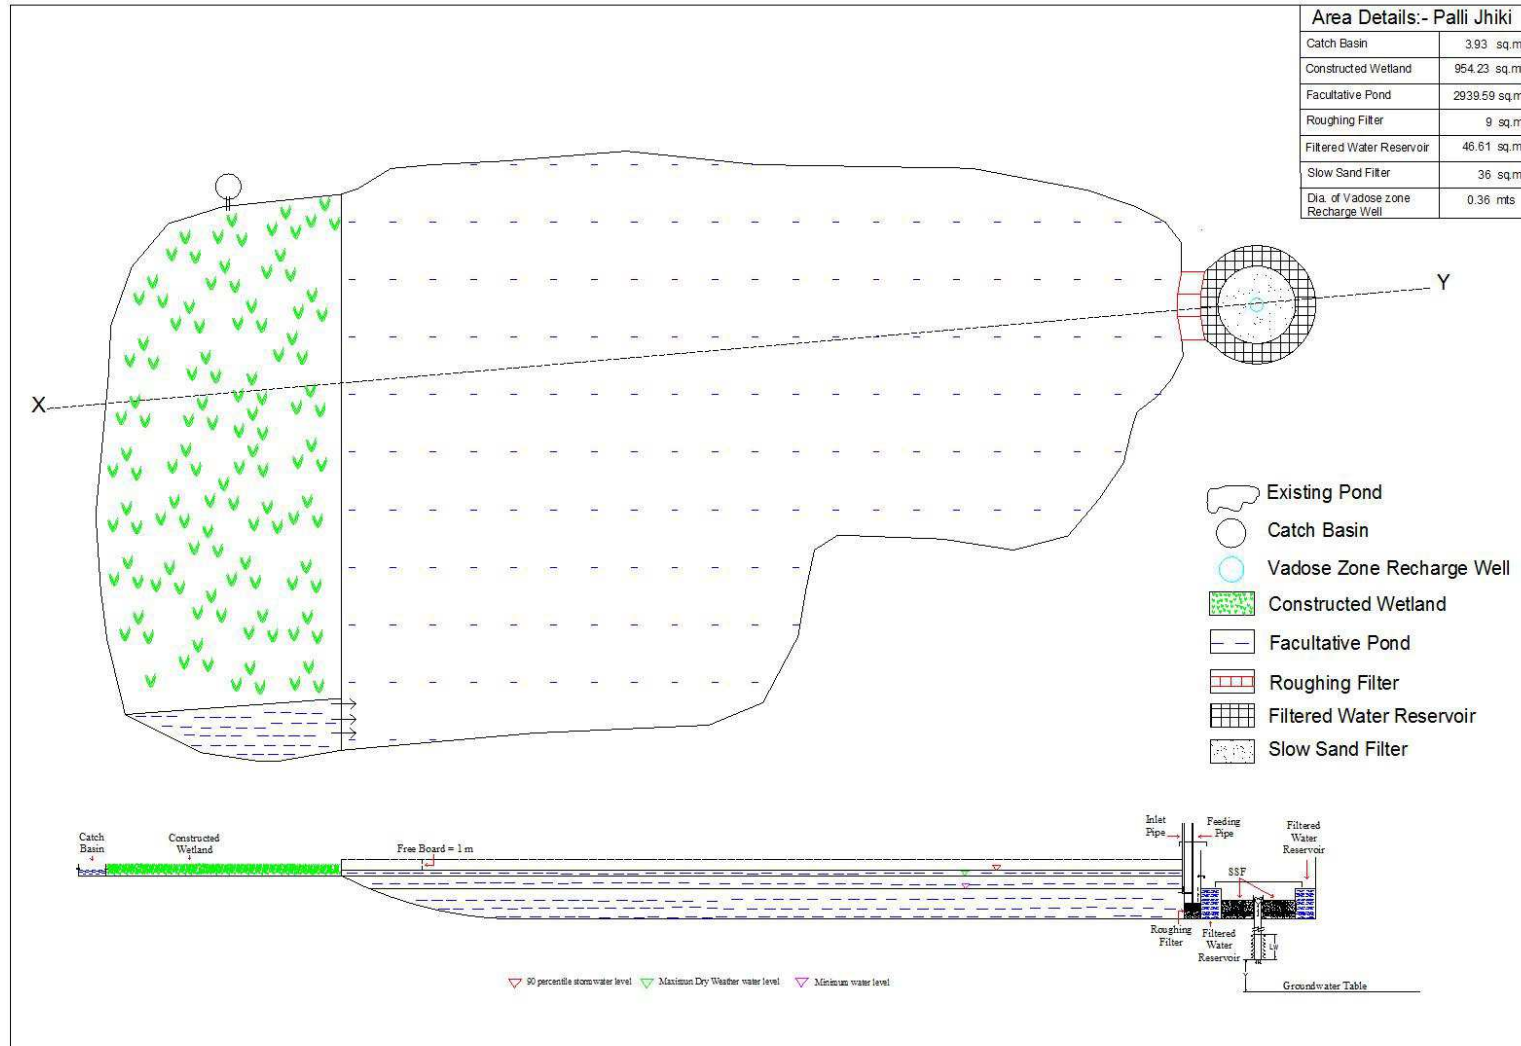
Plan and elevation view of Palli Jhiki village pond system
